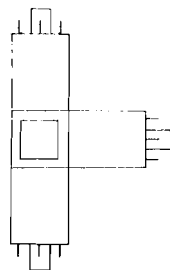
Column element seen from above with protruding beam supports and groove for the column.
